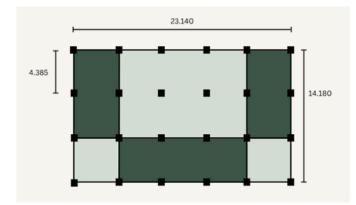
Schematic drawing of the Witte Boei based on building drawings
